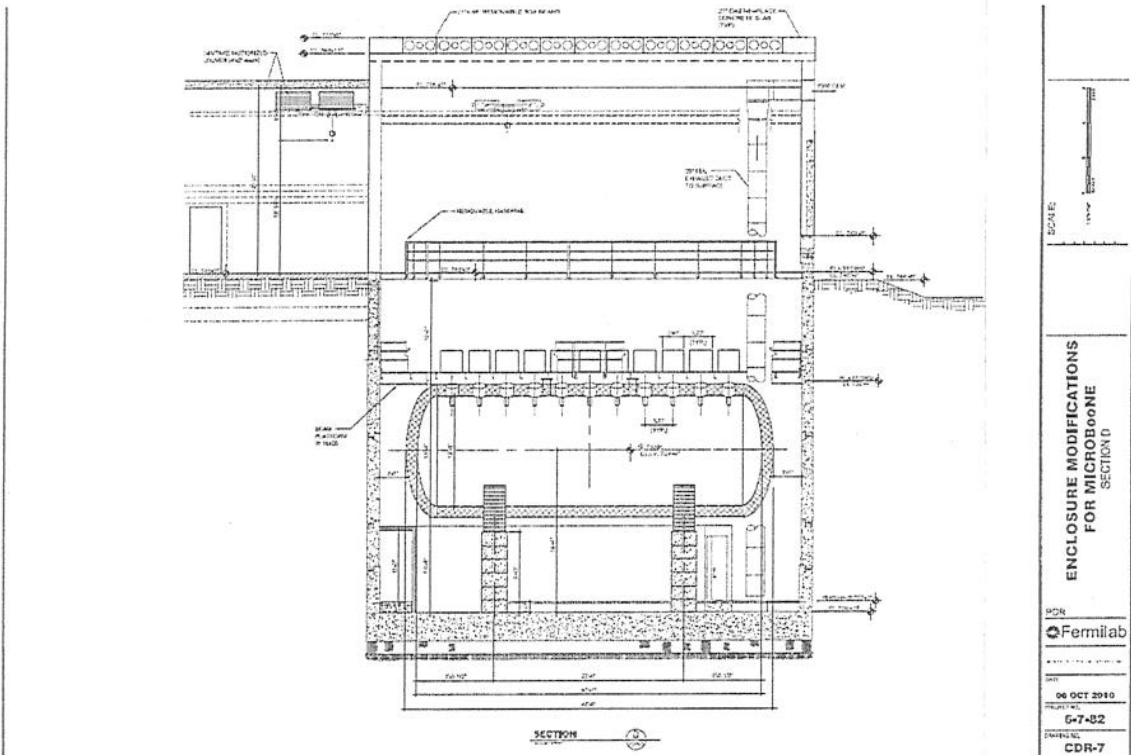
Elevation view (along beam line) showing MicroBoONE Detector in cylindrical pit.
